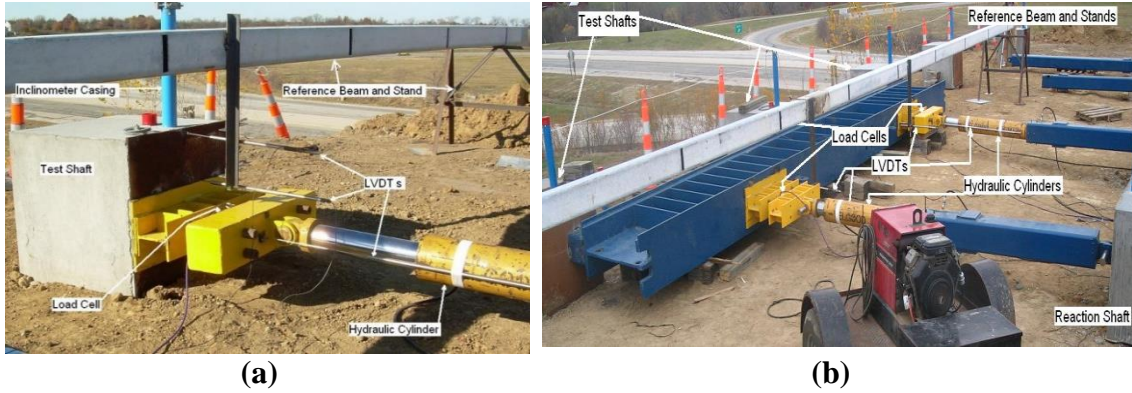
Full-scale tests: (a) single shaft; and (b) group shafts
